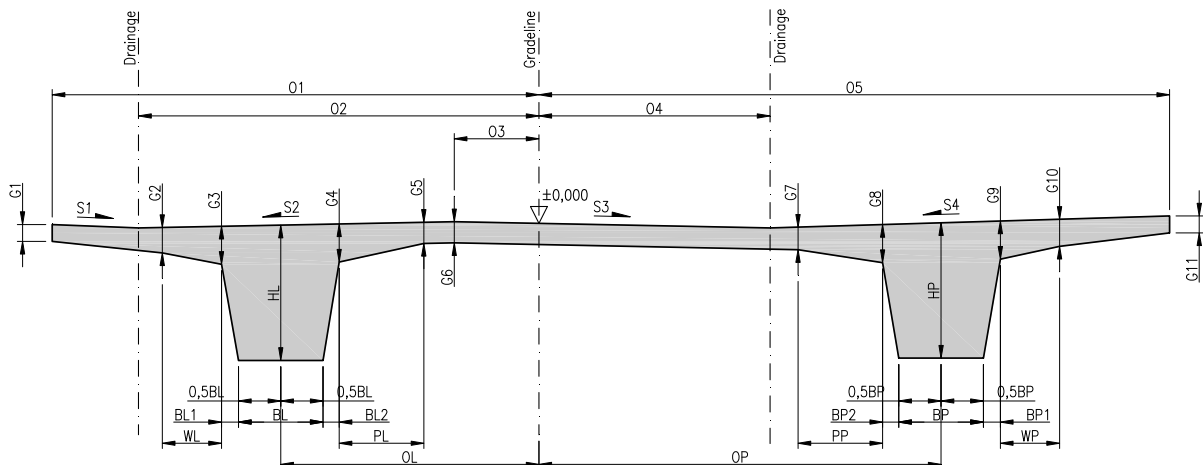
Exemplary set of cross-sectional parameters of WD bridge
